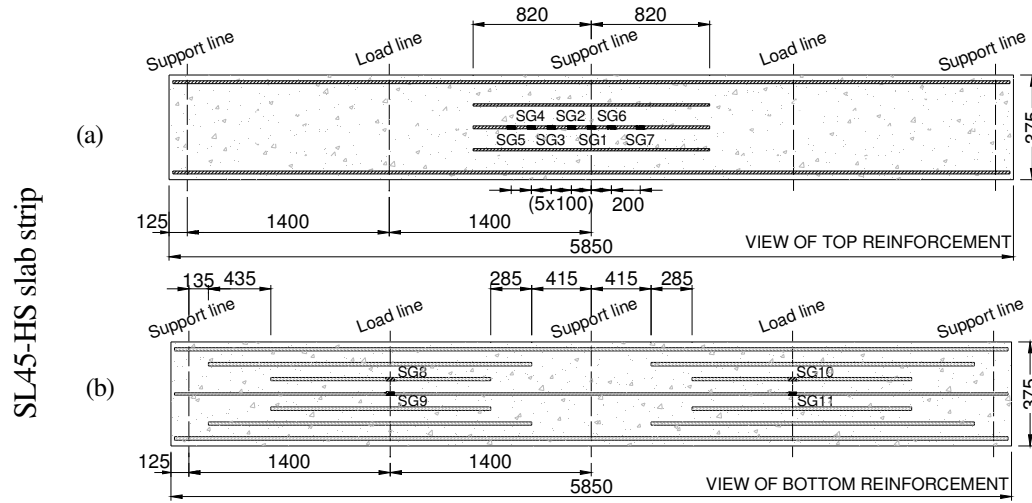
Arrangement of the (a-b) longitudinal steel of the SL45-HS slab strip.
